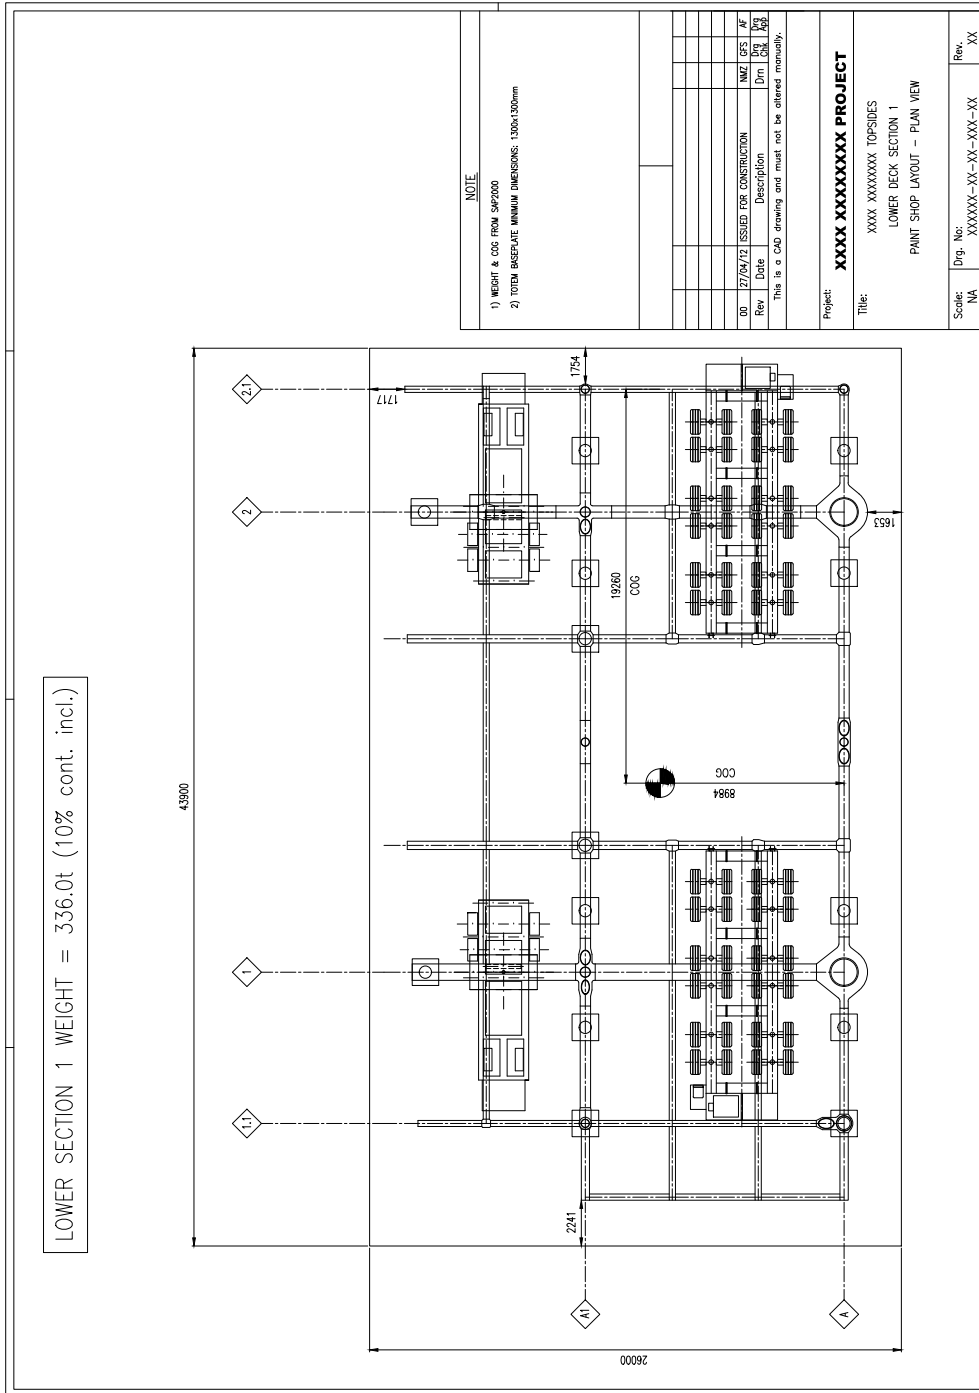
Lower level deck section 1 - Paint shop layout - plan view
